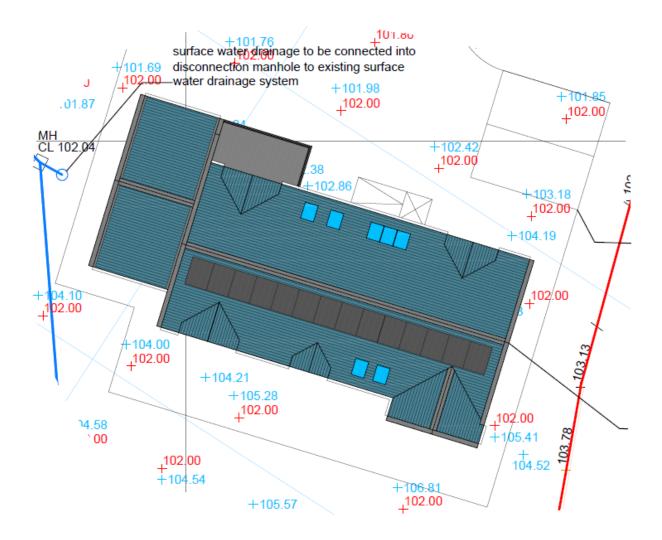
Extract from HWAD-209-MWD-101 Site Layout Plan – as Proposed (Source: Hodgson White Architecture + Design).
